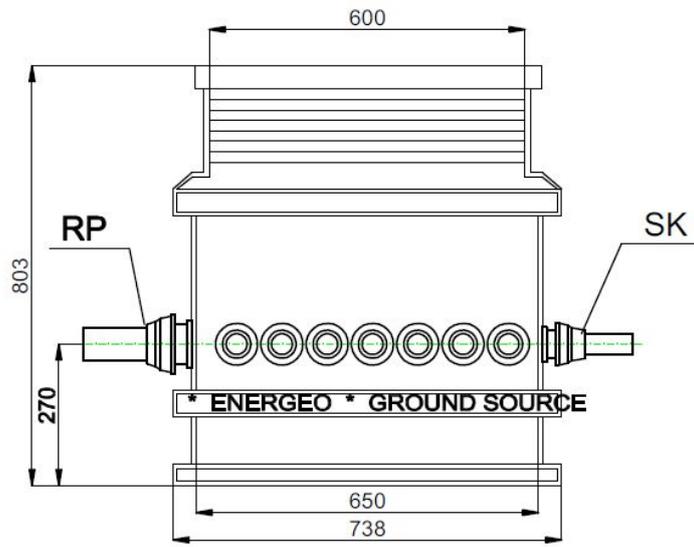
New BRADO-R. 9-section Distribution Well .Cross-section.
